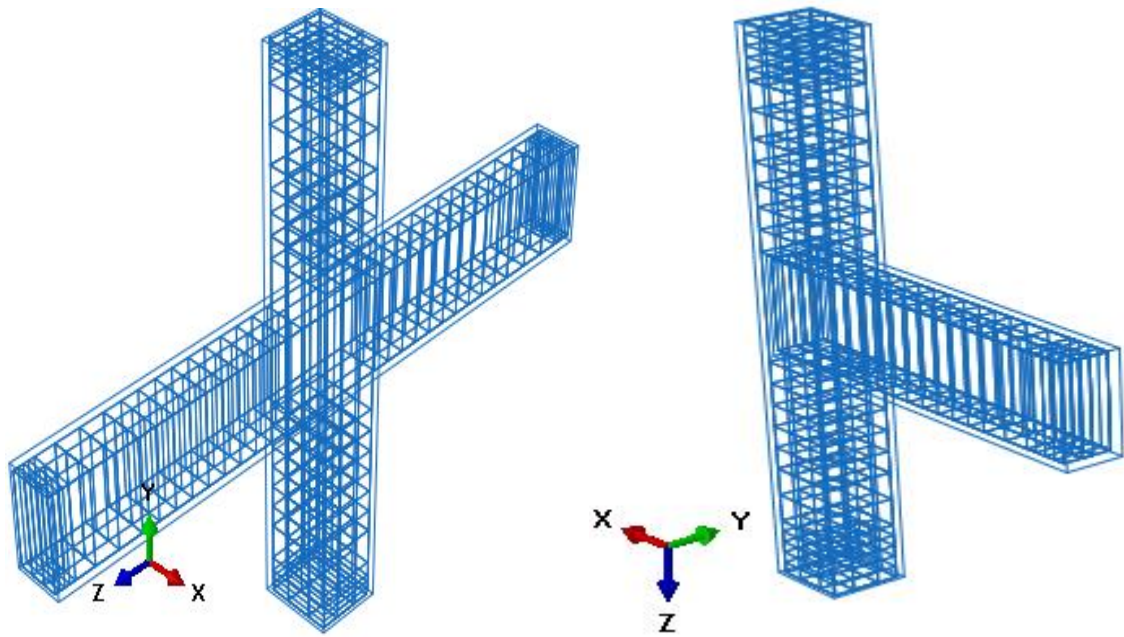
Reinforcement model details of interior and exterior connections
